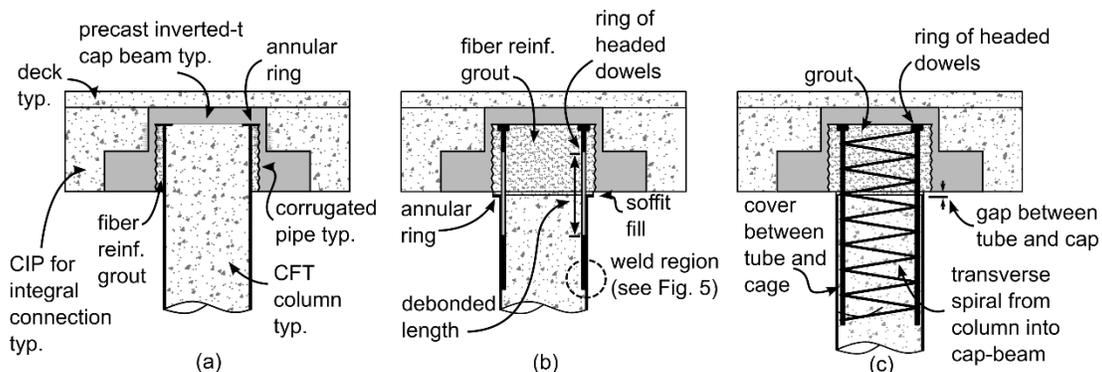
Proposed CFST Column-to-Precast Cap Beam Connections. (a) Embedded Ring Connection (ER), (b) Welded Dowel Connection (WD), and (c) Reinforced Concrete Connection (RC)
